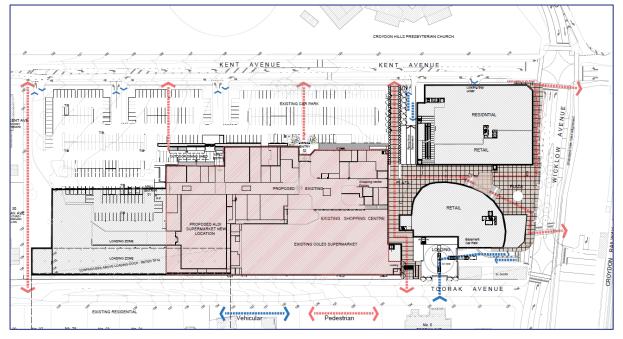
Revised Development Plan - Indicative Site Plan for Stage 2
